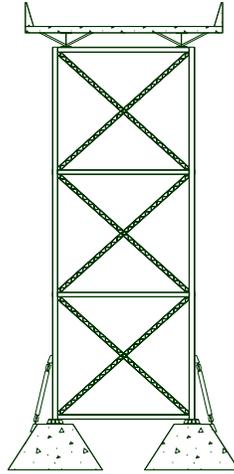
Sketch of retrofitted pier (Pollino and Bruneau 2003).
